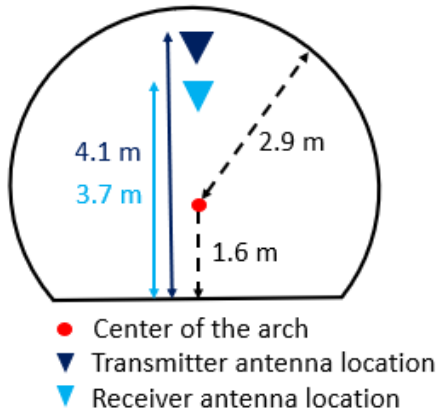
Dimensions of Tunnel's cross section and antenna locations.
